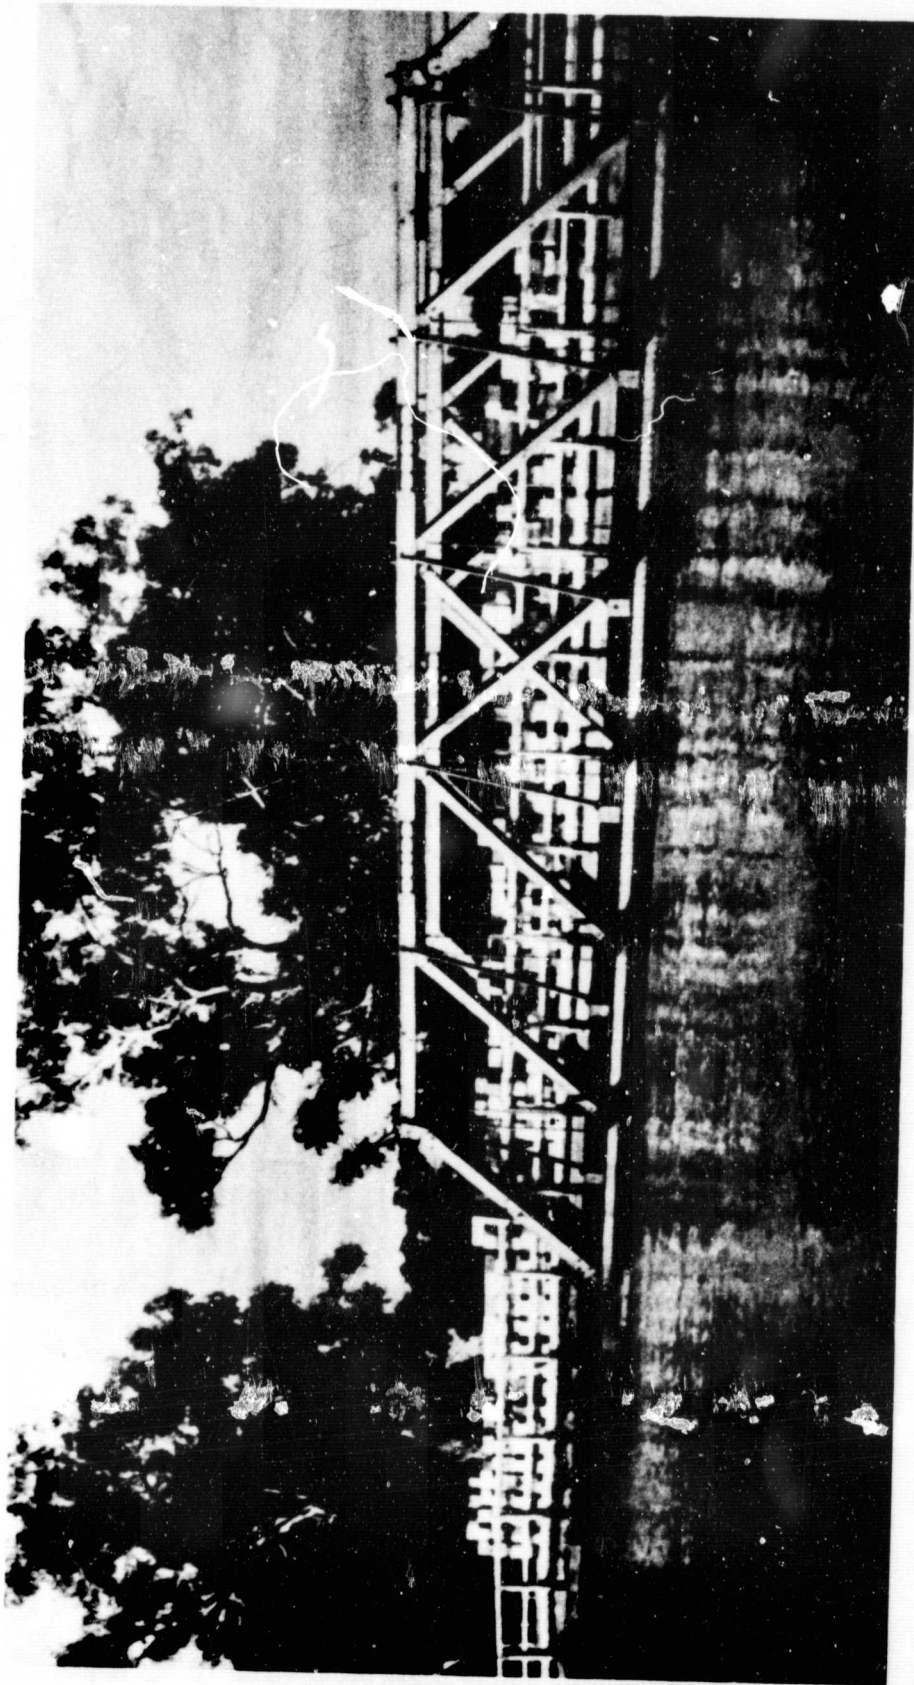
Photograph of Maximum Flooding on 17 January 1974 at the Dangar Bridge, Walgett, New South Wales
